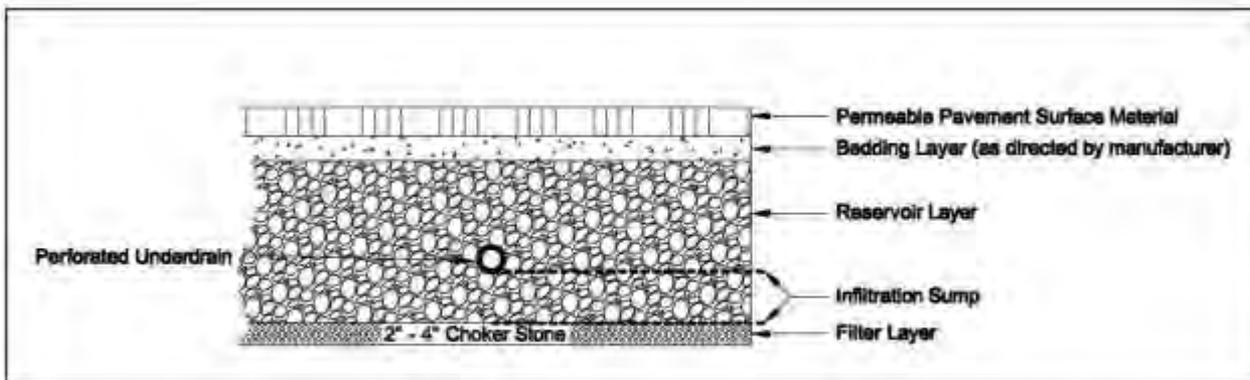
Cross section of an enhanced permeable pavement design with an underdrain.
